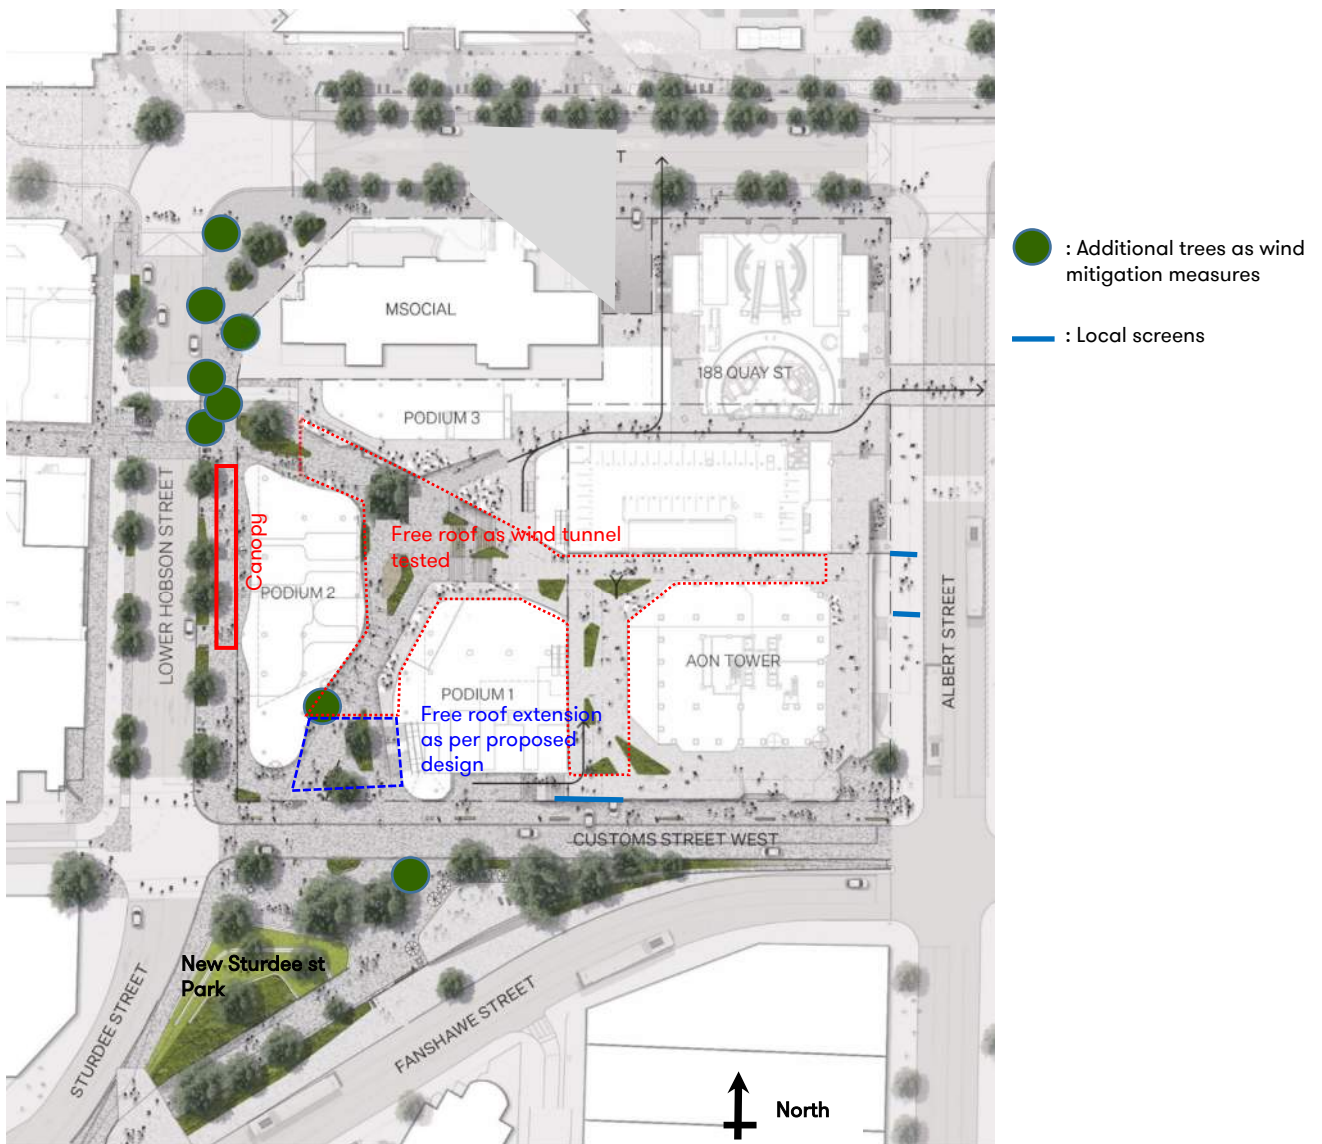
Context Plan with Mitigation Measures as Wind Tunnel Tested
